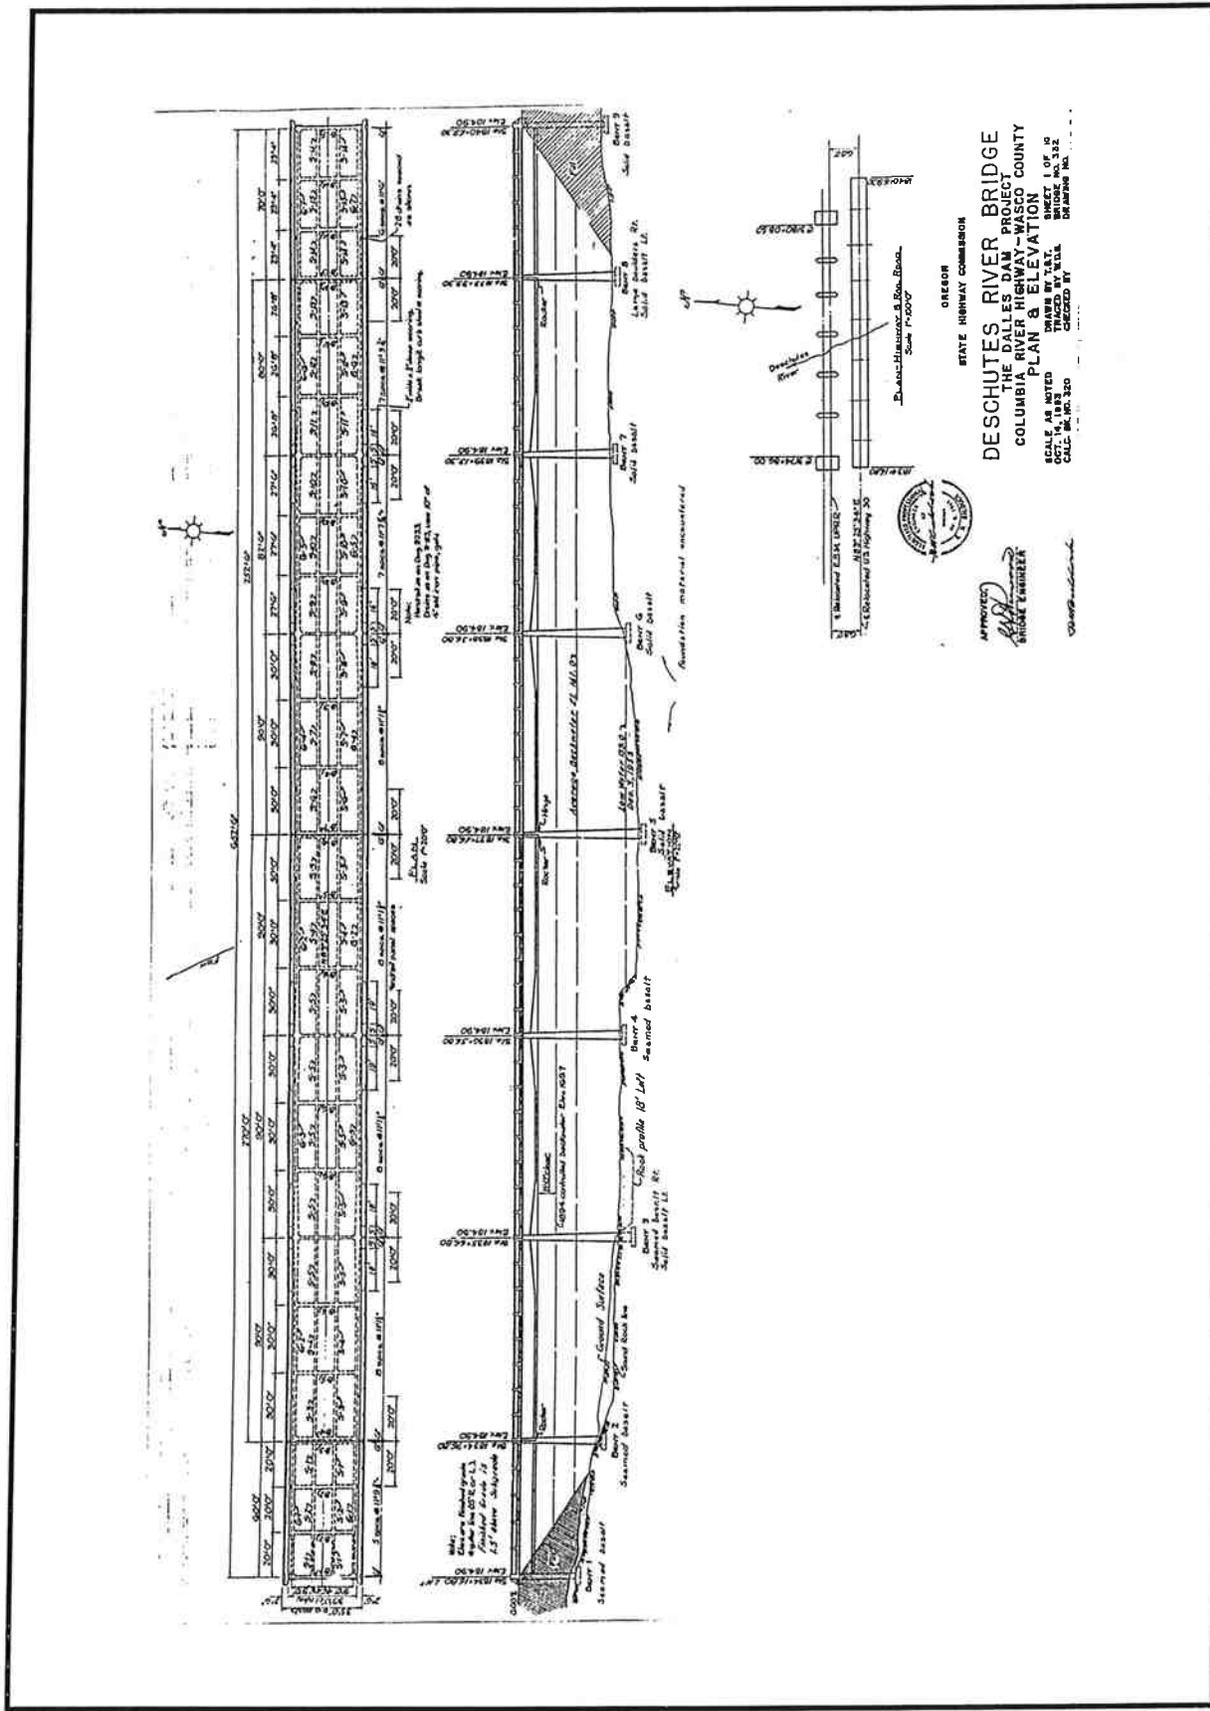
Deschutes River Bridge Plan and Elevation.
